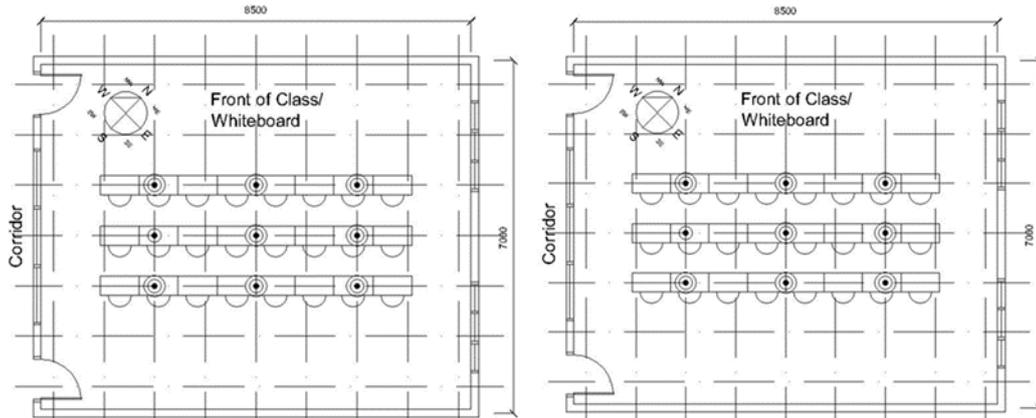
Classroom One (left) and Two (right) floor plan layout and illuminance spot measurement grid
